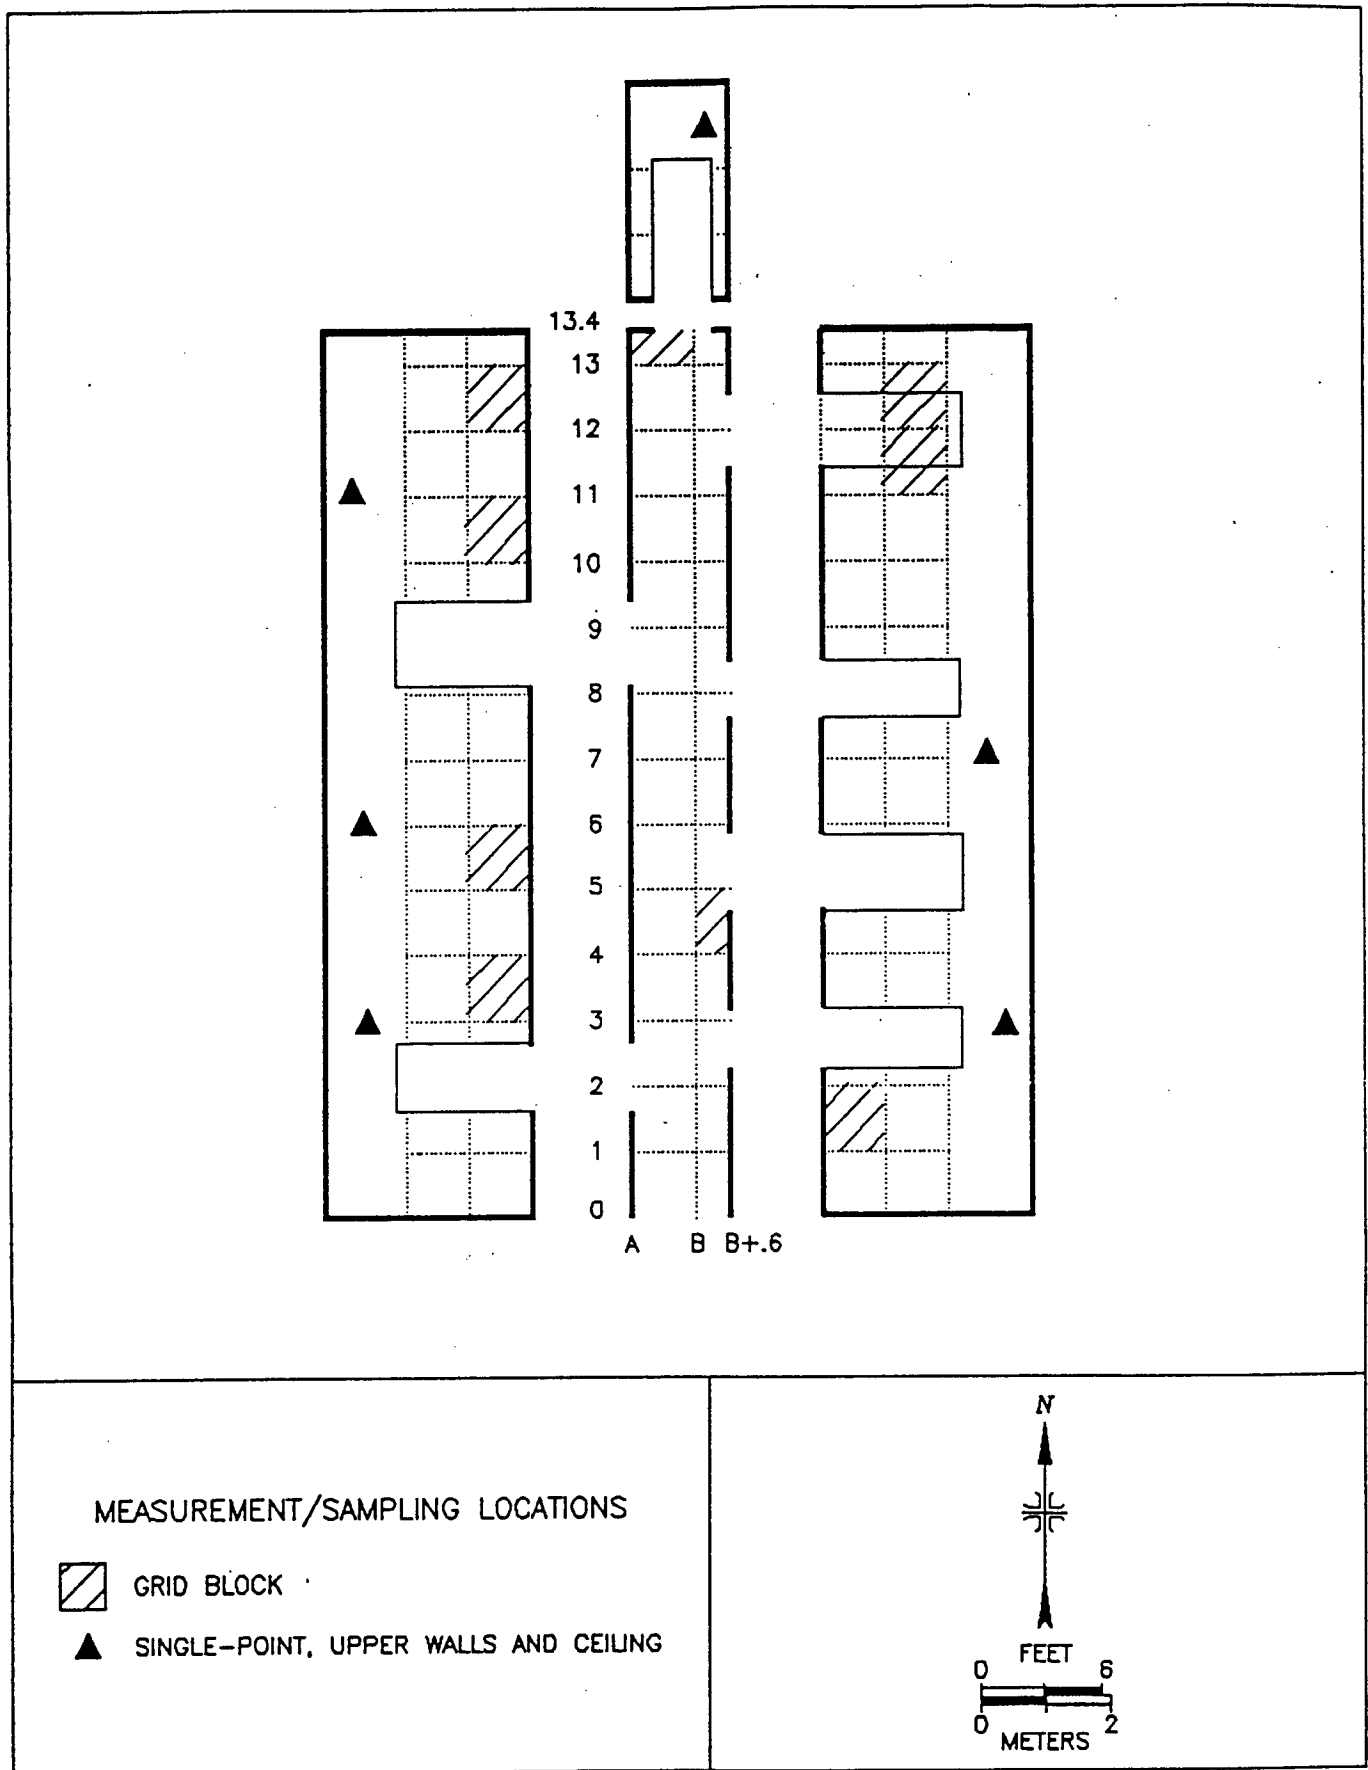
Building 401A, Room 10 – Measurement and Sampling Locations
